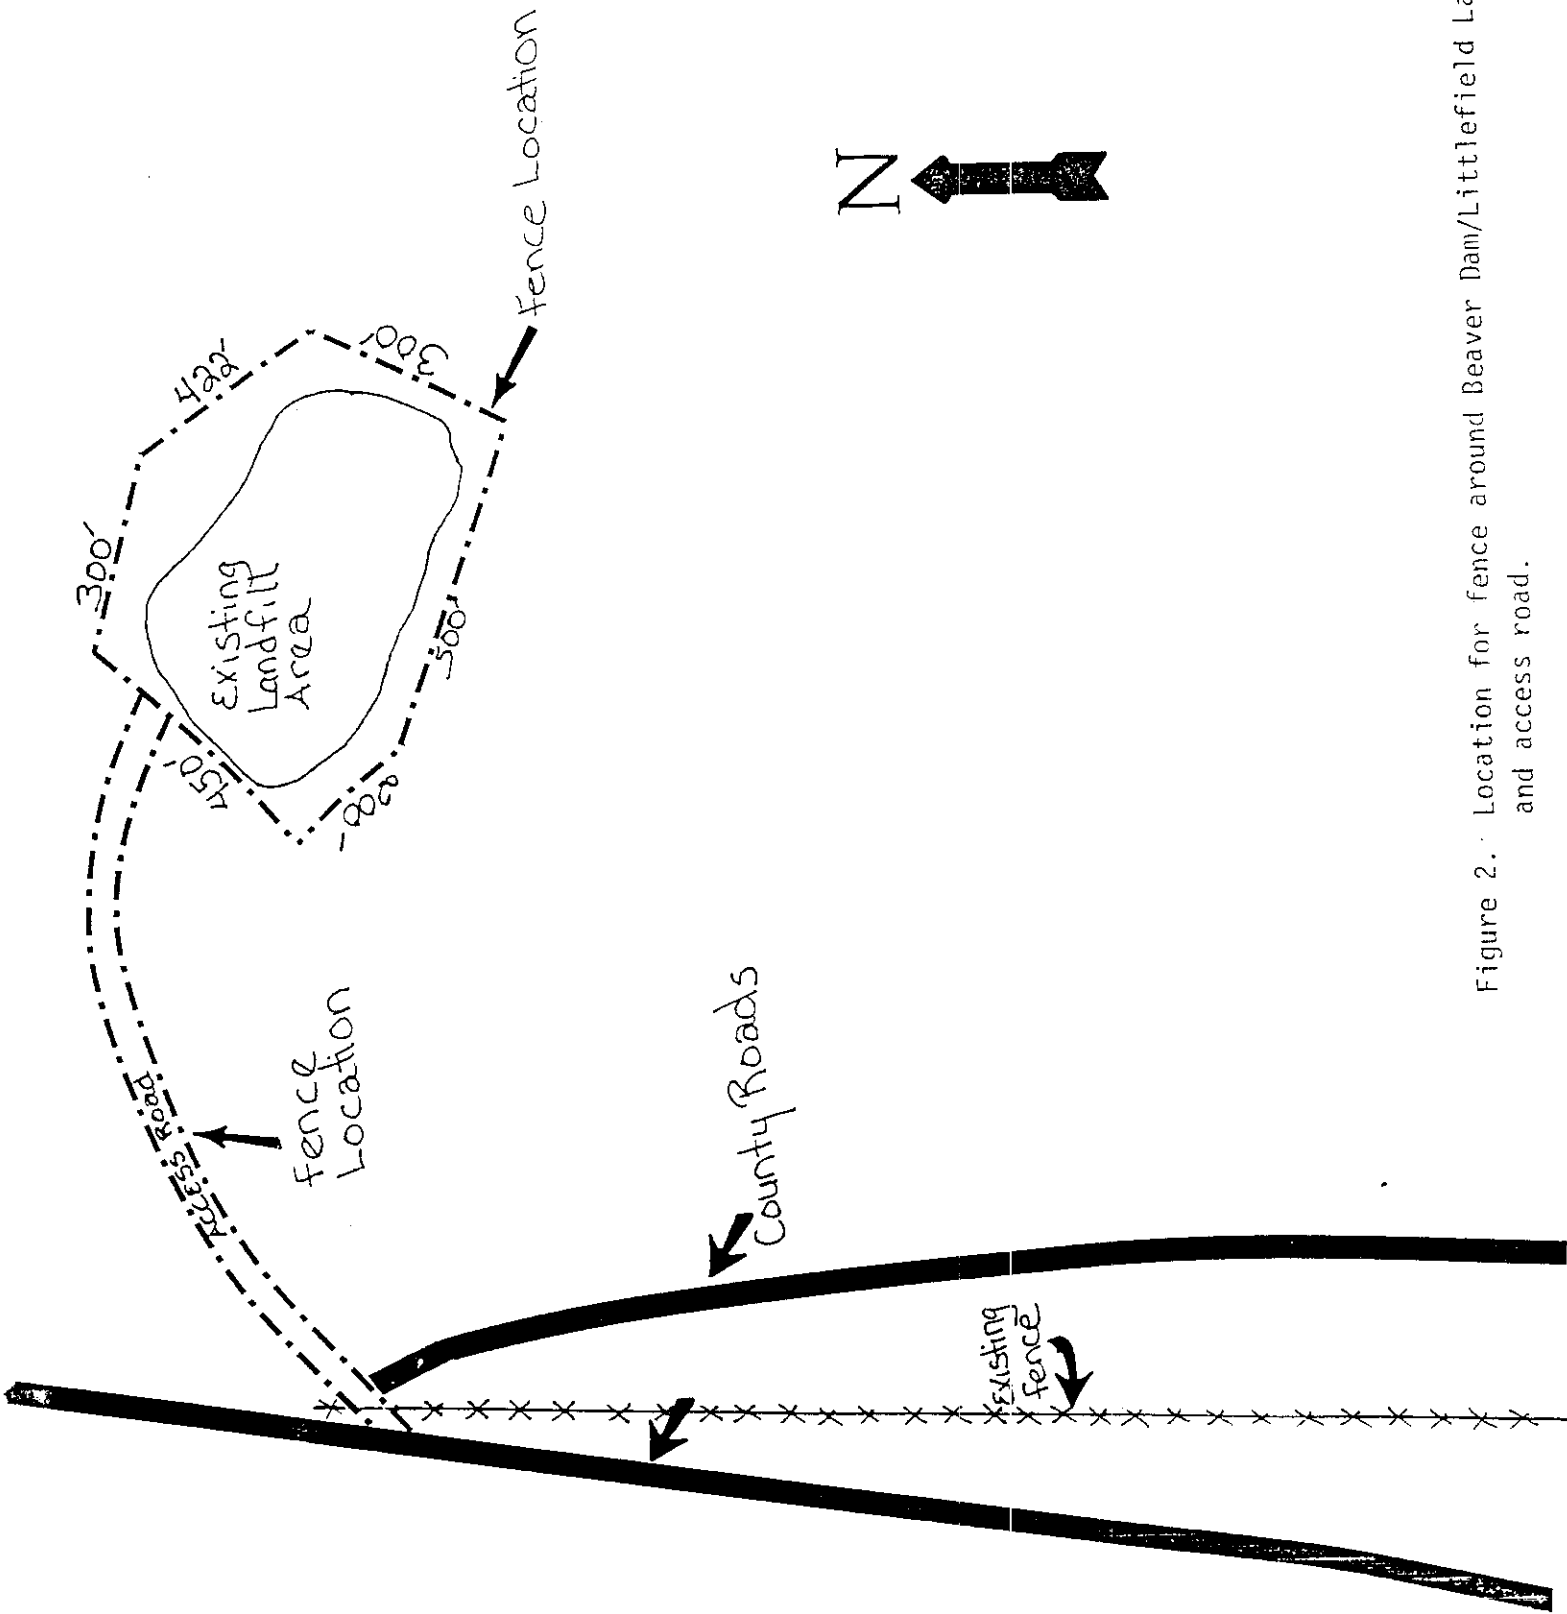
Location for fence around Beaver Dam/Littlefield Landfill and access road.
